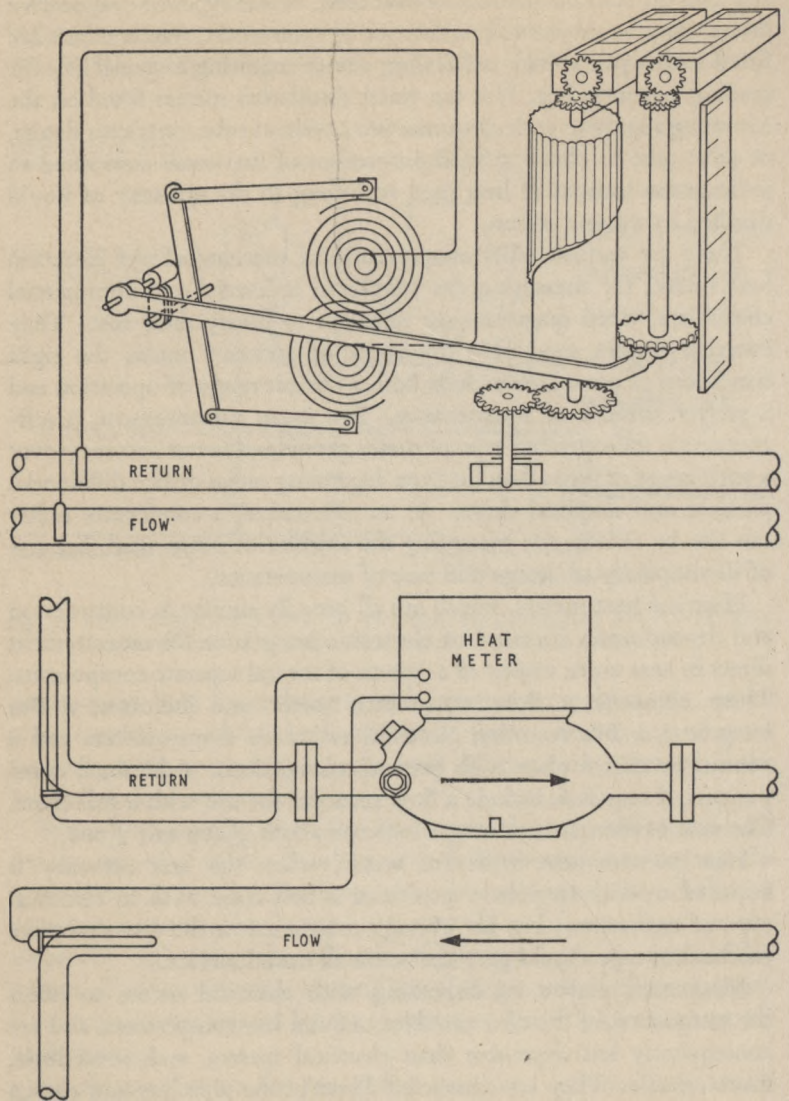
MECHANICAL TYPE OF HEAT METER. (Above) Arrangement of measurement and indicating mechanism. (Below) Assembly of meter and probes in pipe lines
